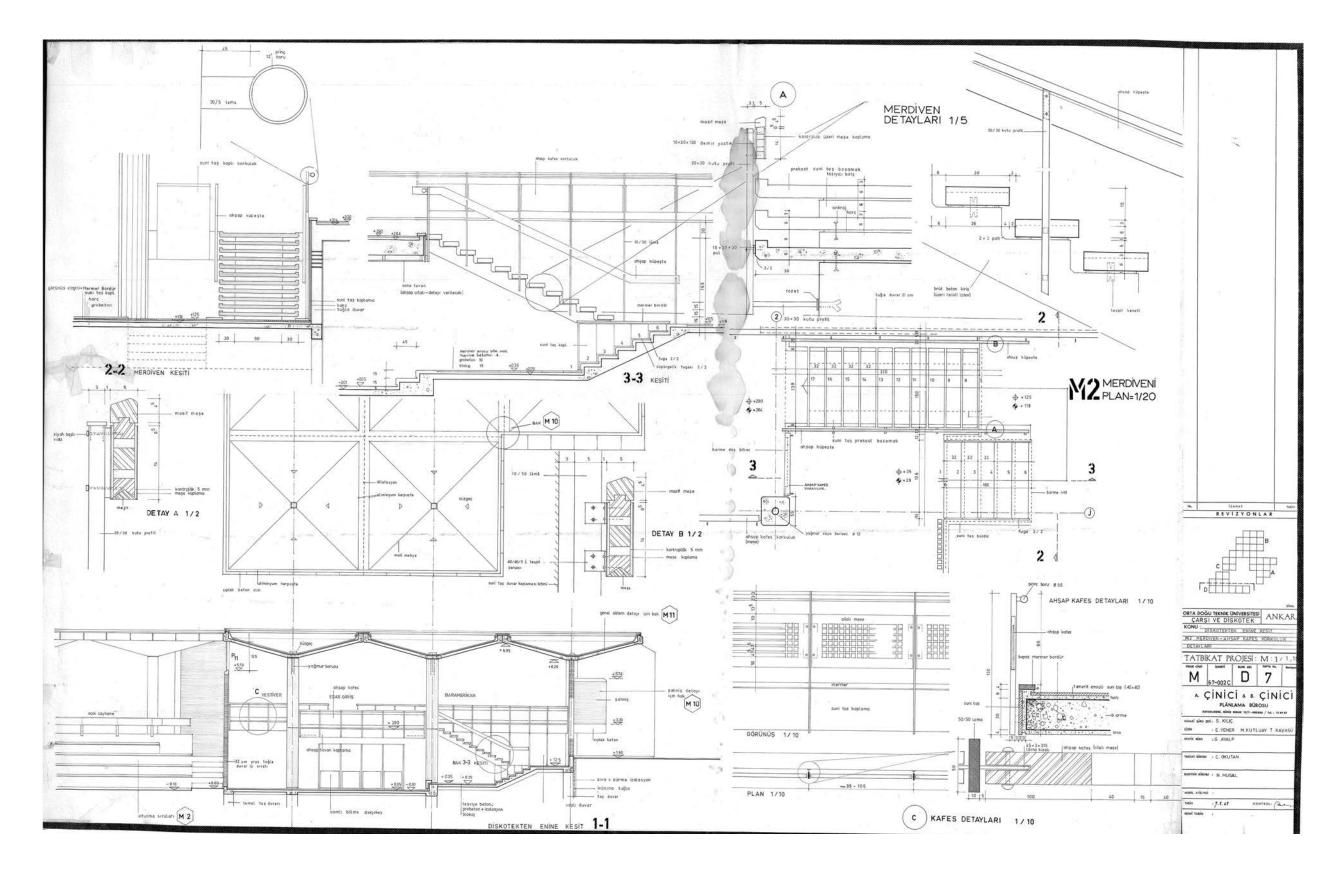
Original Drawing; Latitudinal Section of Discotheque, System Details of M2 Stairs, Timber Mesh Railing Source: METU Directorate of Construction & Technical Works
